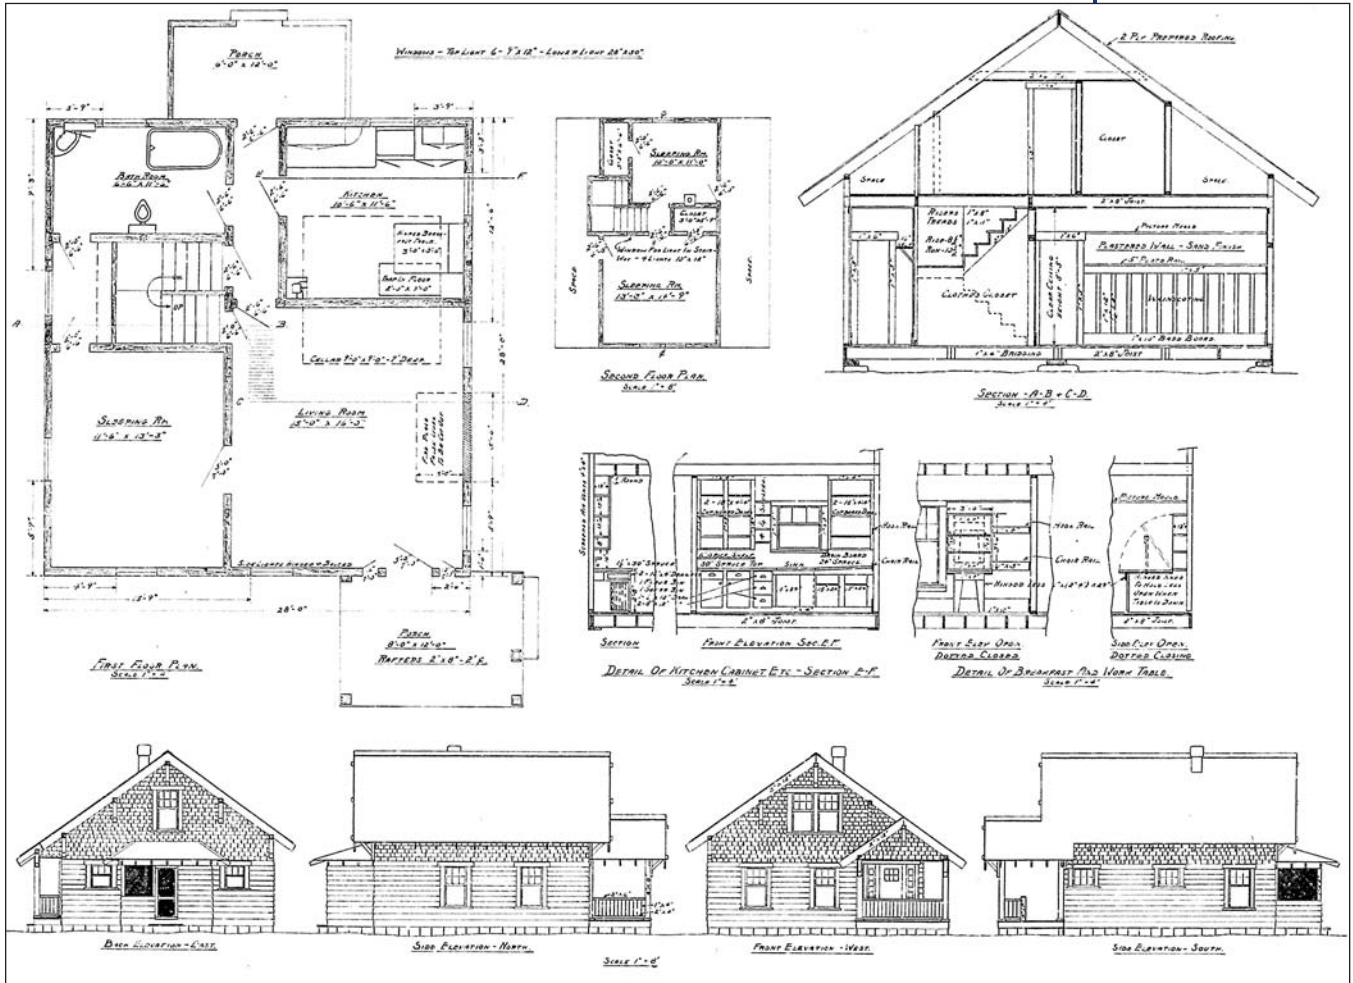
Building plans for the four cottages built in 1917 (Buildings 1-4).
